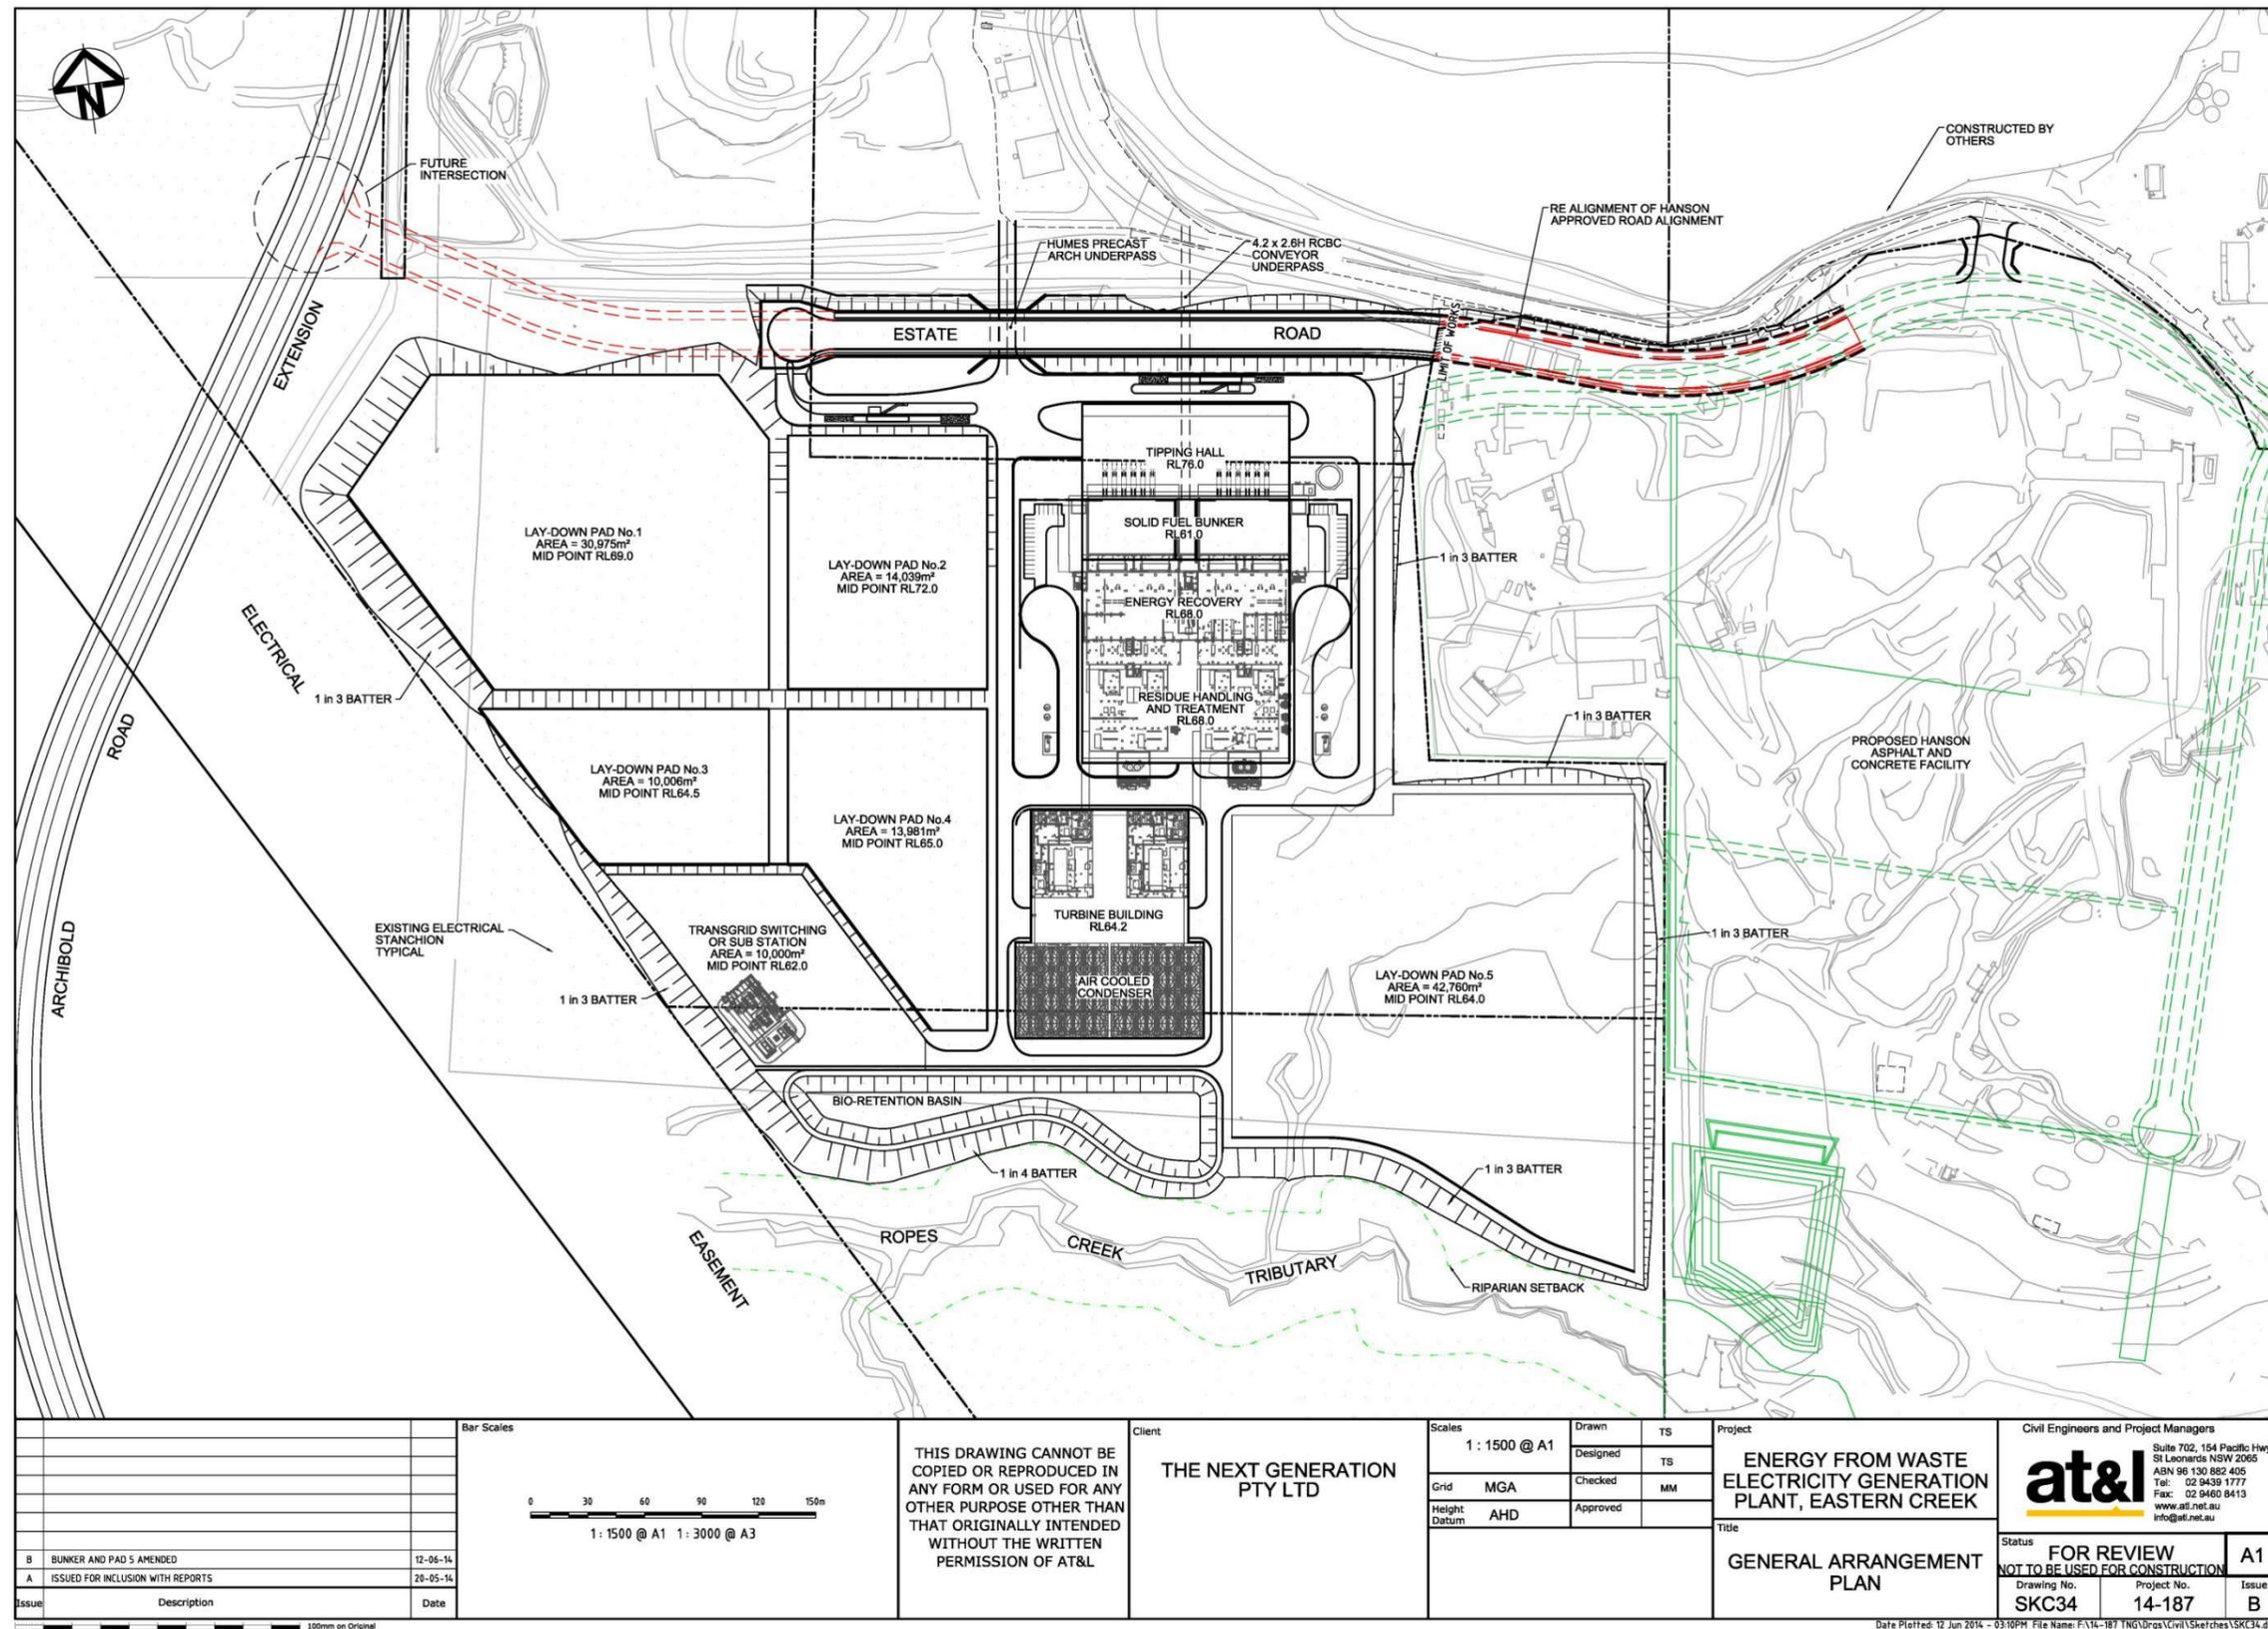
Current plan of the proposed EFW facility. (Source: Urbis)
